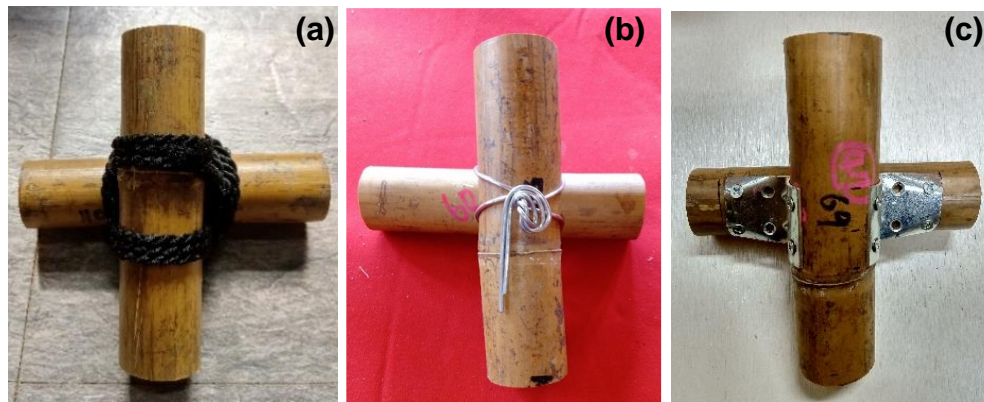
Specimen of lashing joint (a), iron wire joint (b), and steel angle bracket joint (c)
